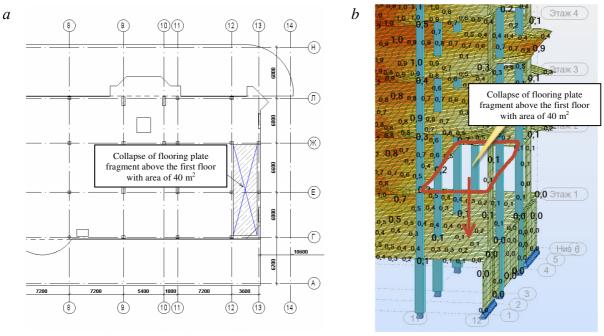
Calculation scheme of emergency situation No3 – collapse of flooring plate fragment above the first floor with area of 40 m<sup>2</sup>, that fell on the parking flooring: a – calculation scheme layout; b – finite-element scheme
